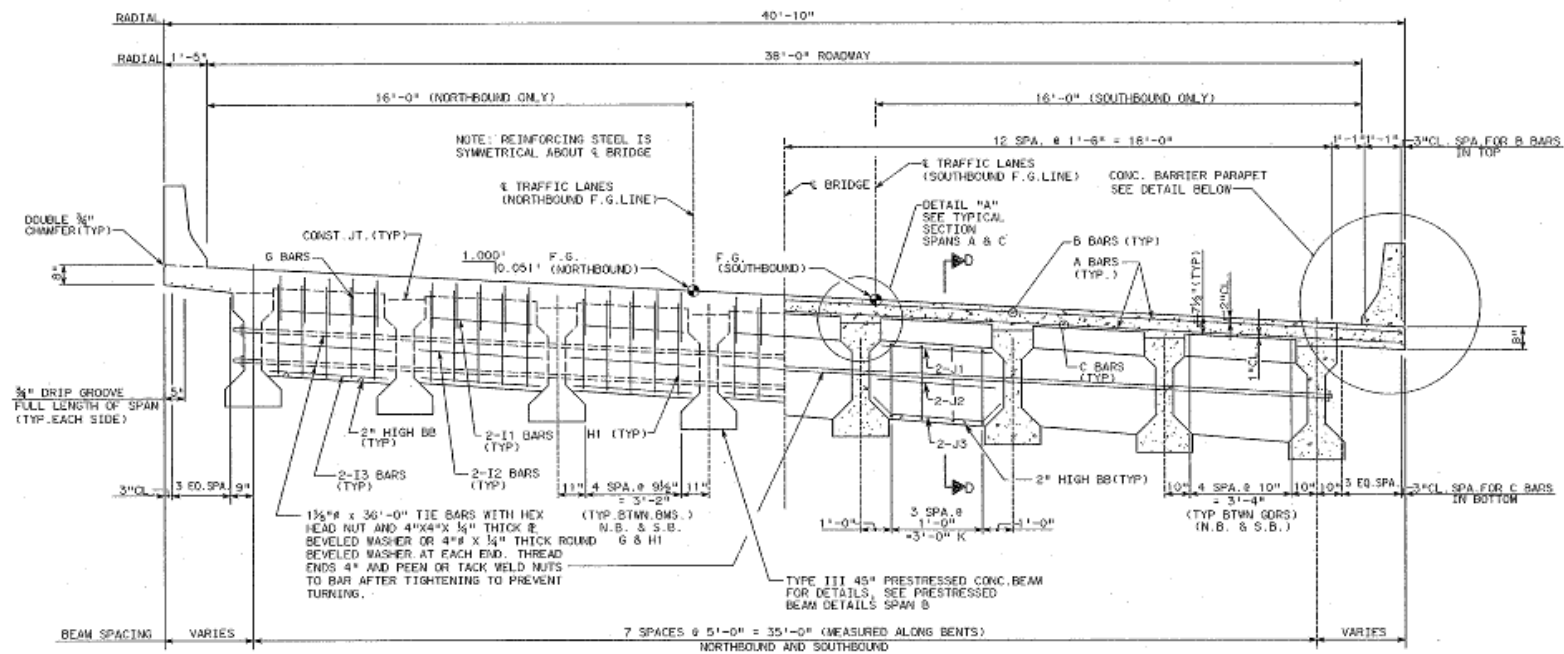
Cross-Sectional View of Archetype 3 Bridge (Barrett 2011).
